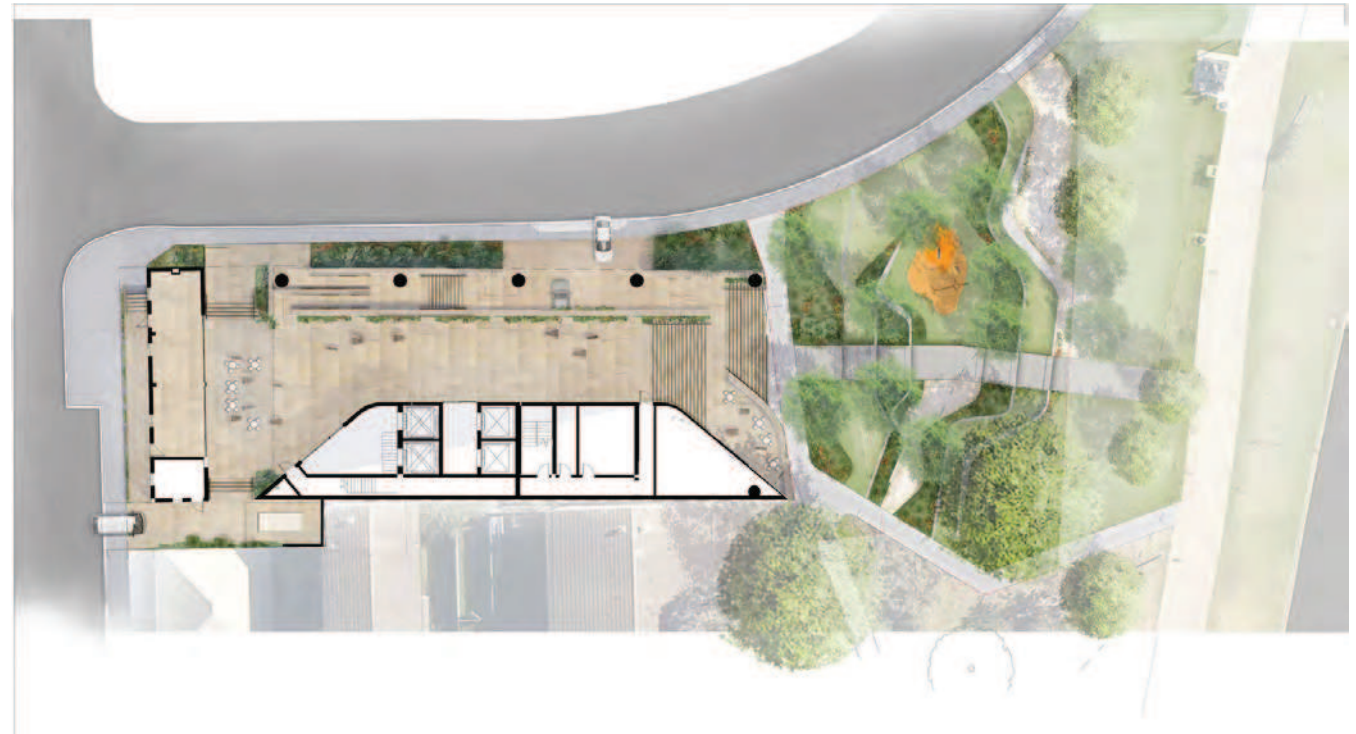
Ground Floor Landscape Plan (Source - JSA Studio)
